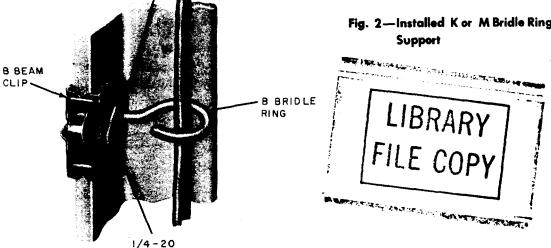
Installed B Bridle Ring Using B Beam Clip
